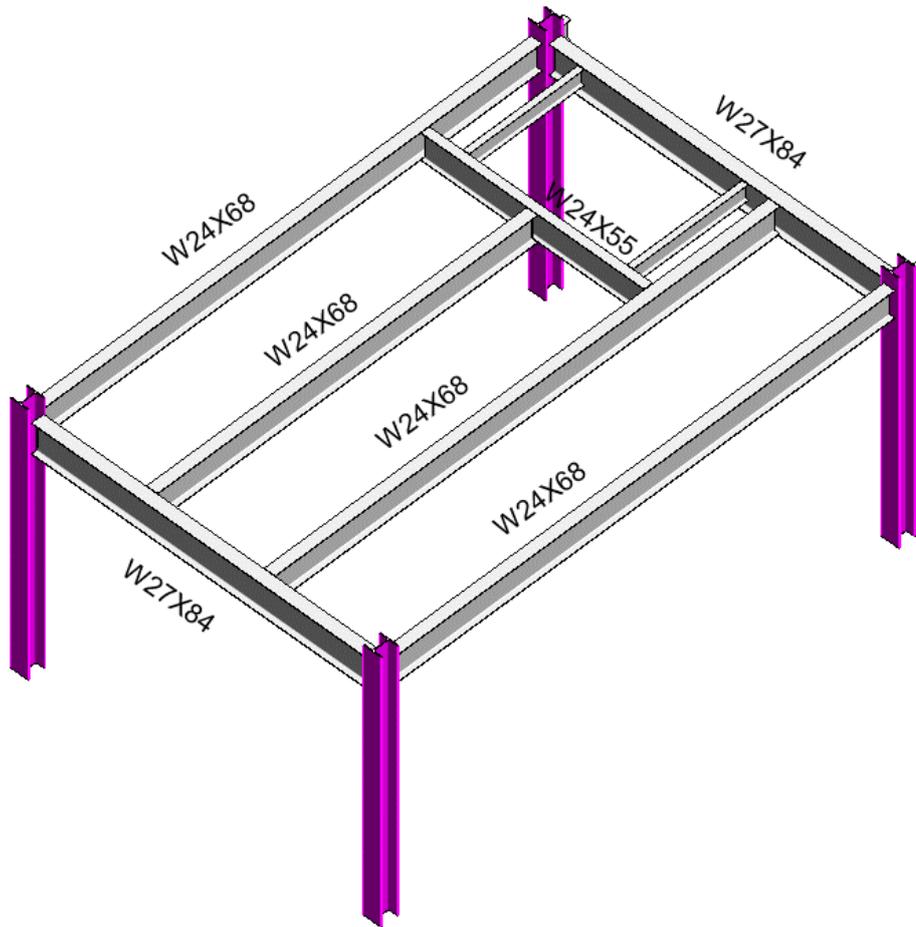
Framing Configuration Isometric View – 65% Design Drawings
